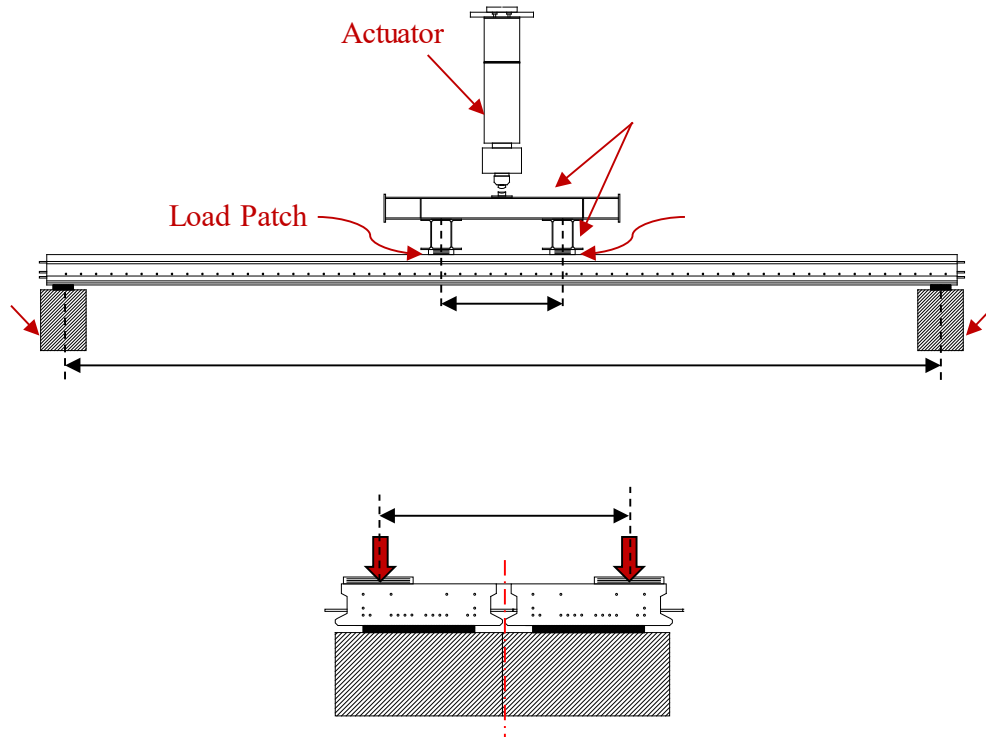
Test setup for one loading case for two-beam configuration (a) elevation and (b) section views
